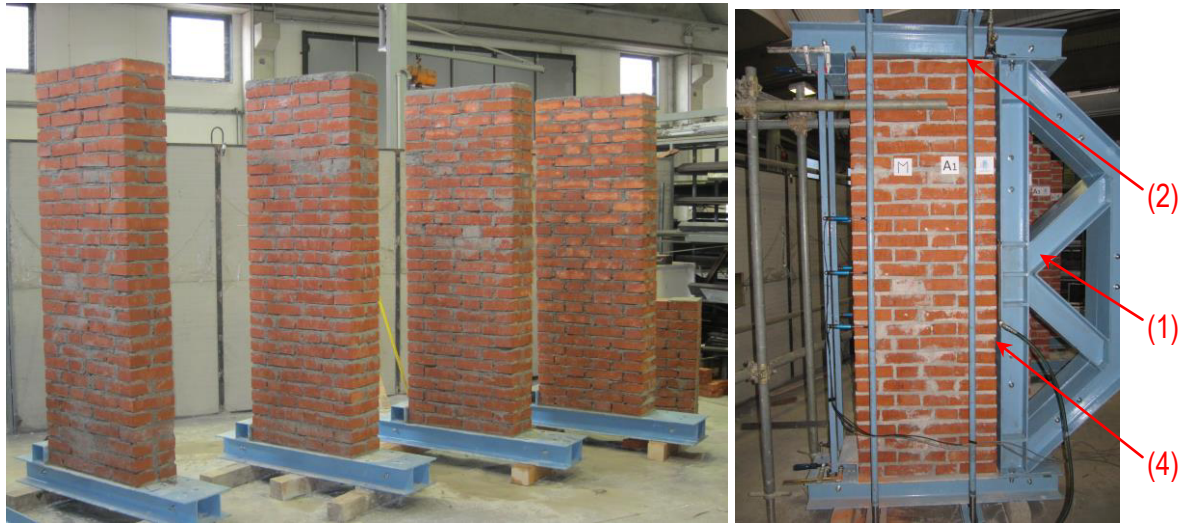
4: Laboratory wallets, contrast frame used for the laboratory tests.
